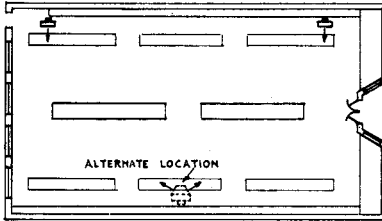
Typical installation of horizontal air discharge unit heaters in retail store. Low speed units are best suited.
